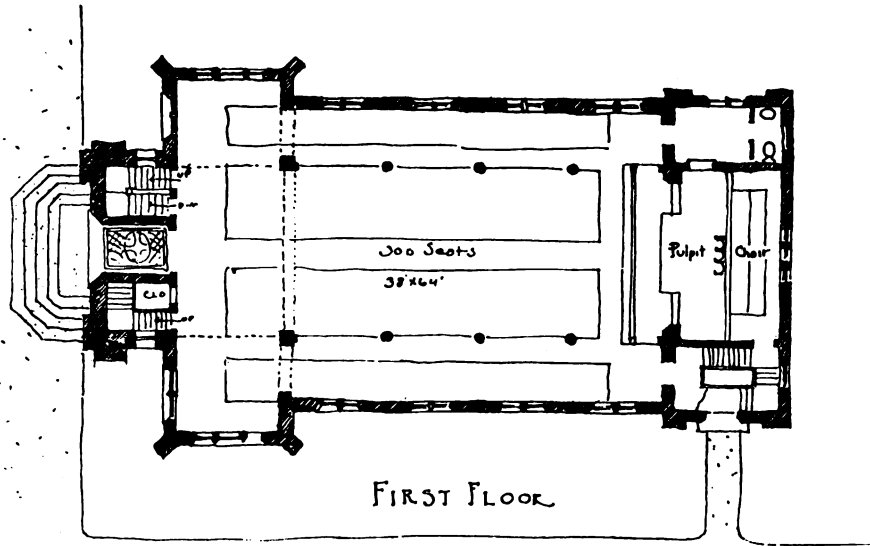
CHURCH AT KATONAH AVENUE, NEW YORK CITY—MAIN FLOOR PLAN.
